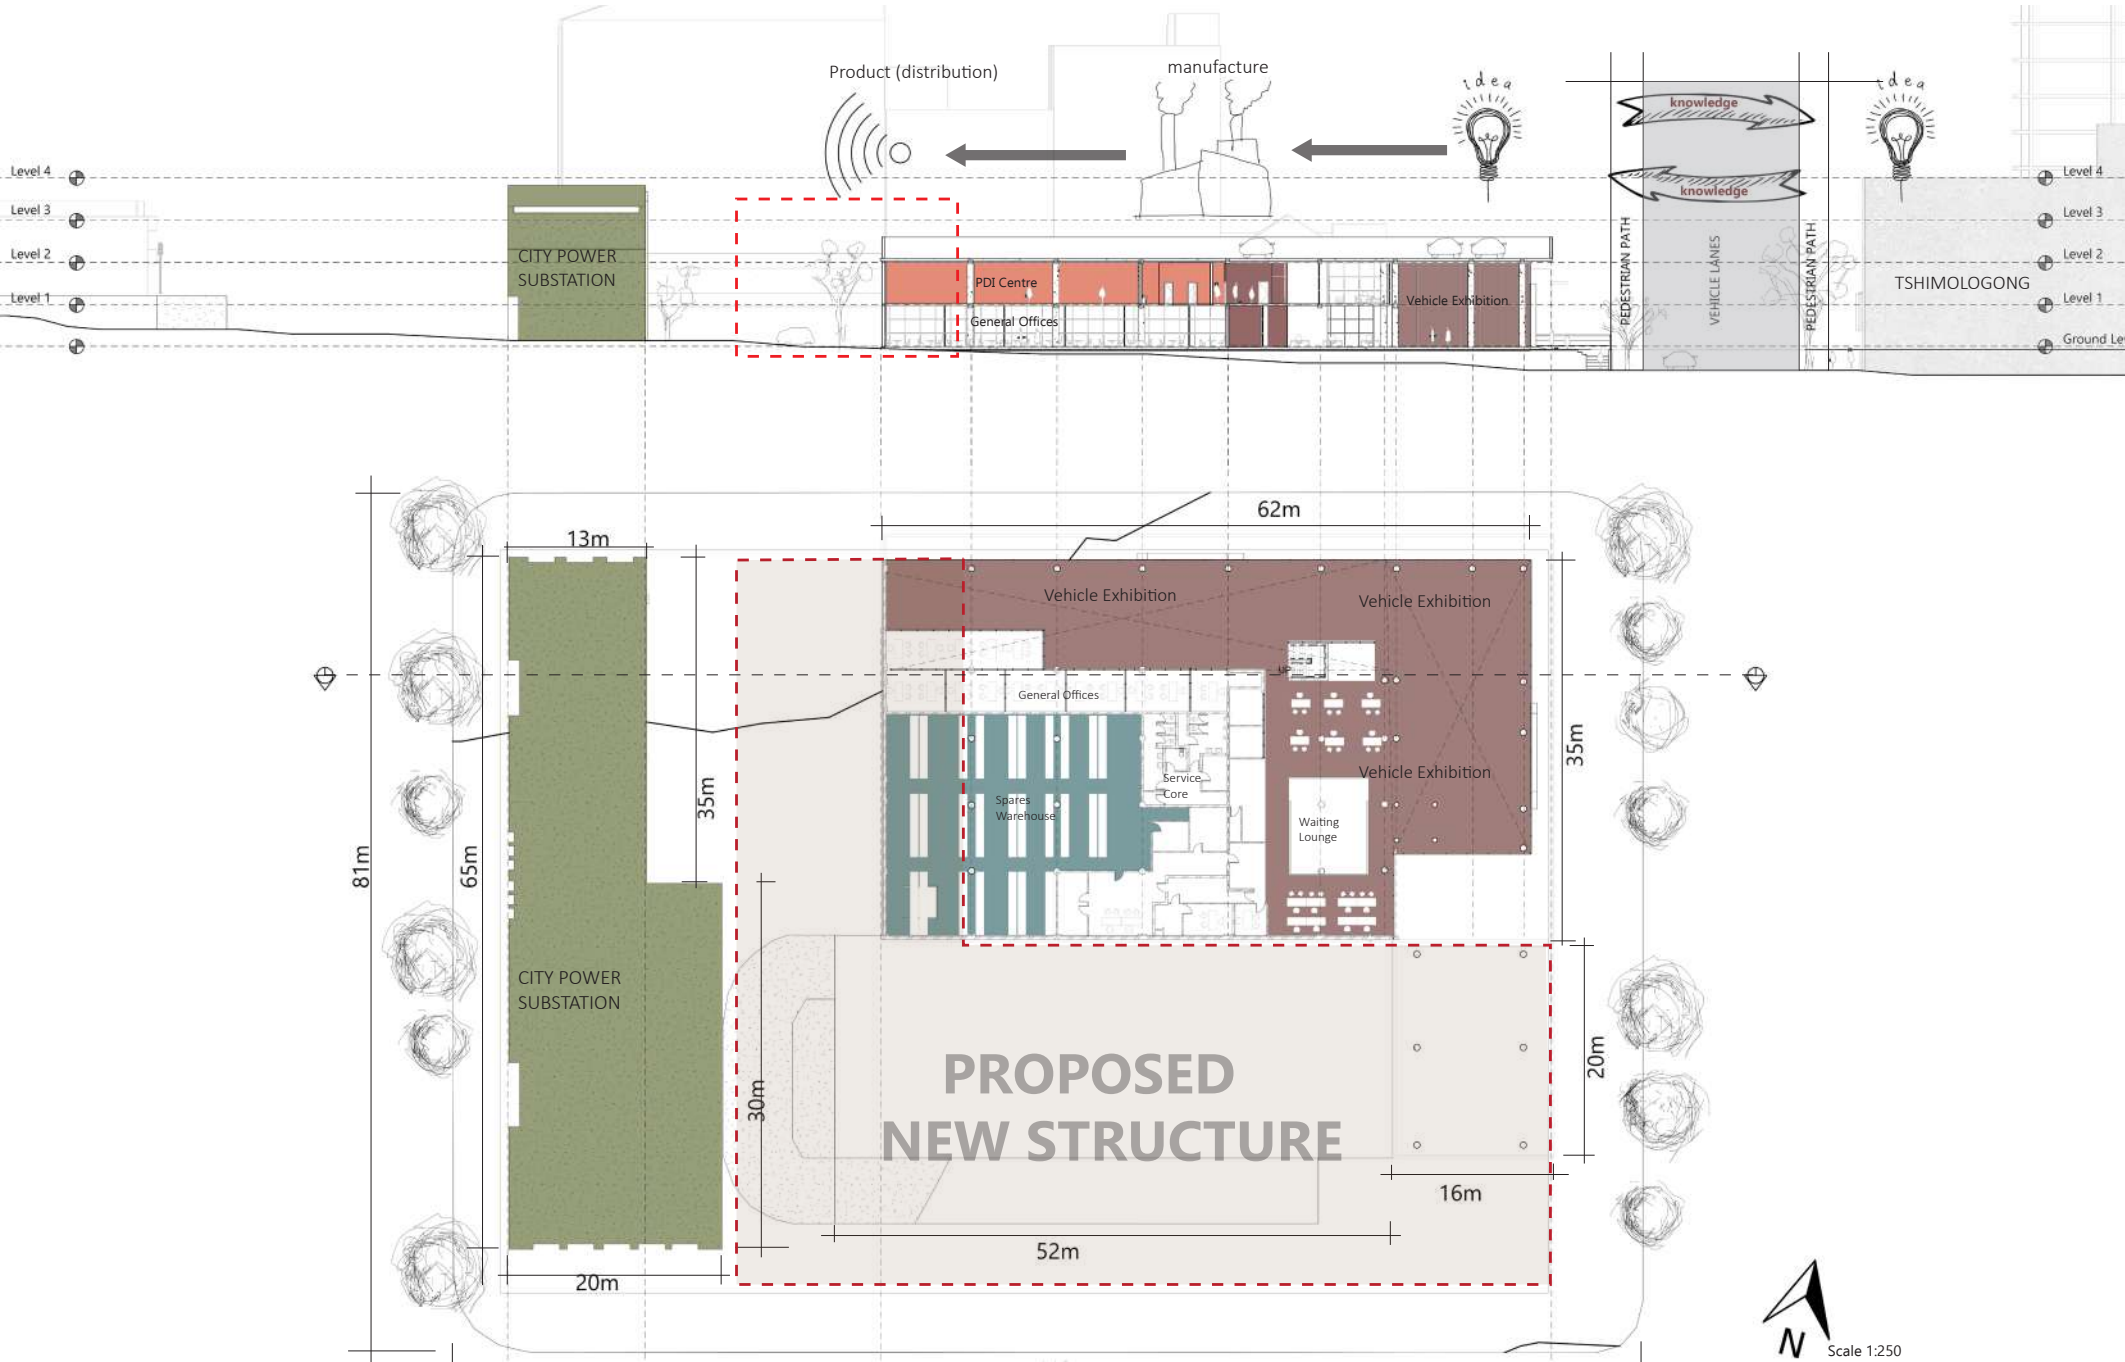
(iv): Plan and Section Drawing illustrating Existing Building and Proposed Site Strategy, (Author 2020).
